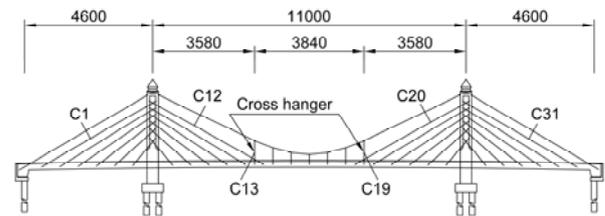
Structural dimensions of the Zhuanghe Jianshe Bridge. (Units: cm)
